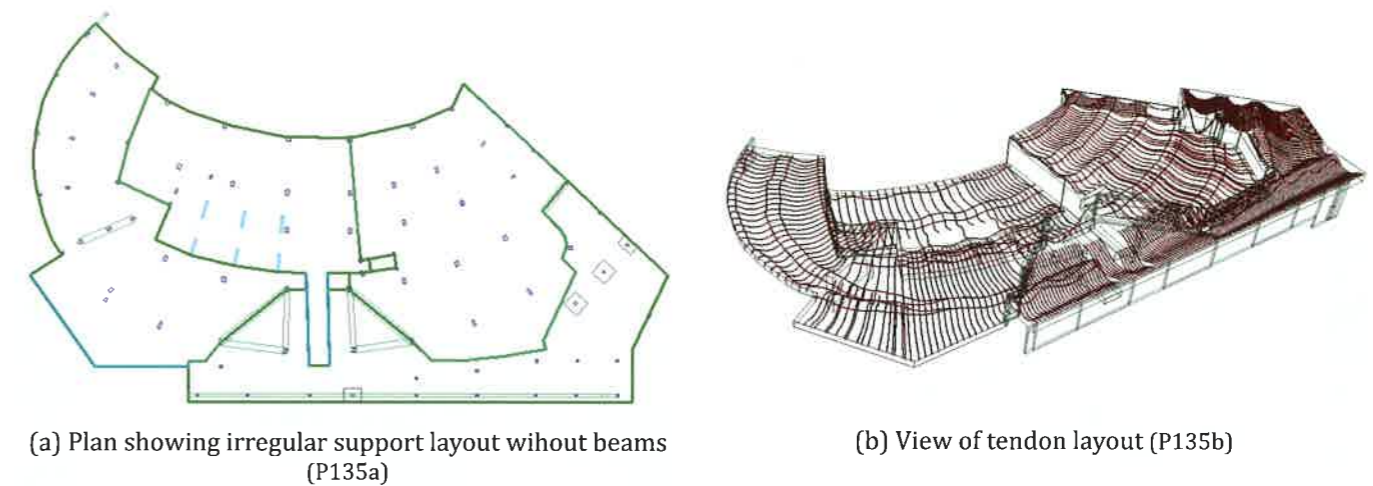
F-1 Example of an Irregular Floor Geometry and Support Layout (Alta Hospital Podium, USA)
